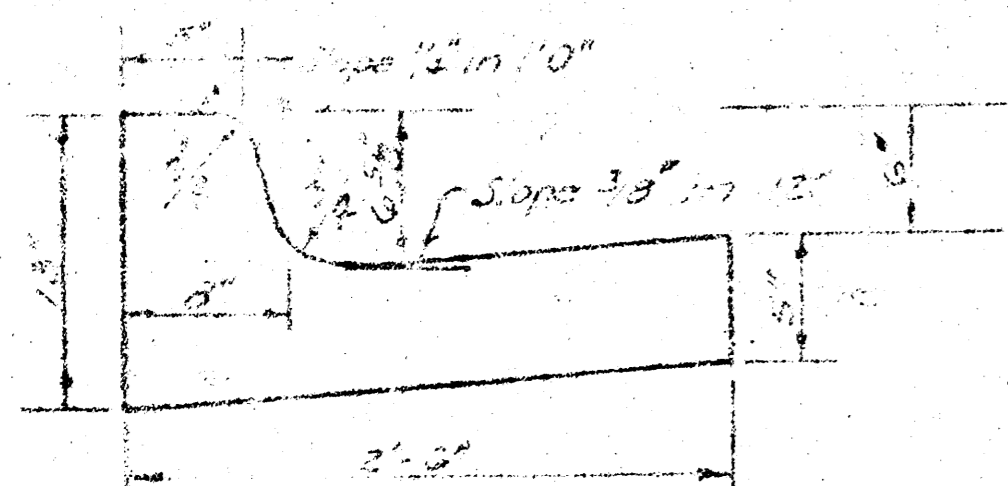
DETAIL OF TRANSVERSE CONSTRUCTION JOINTS
